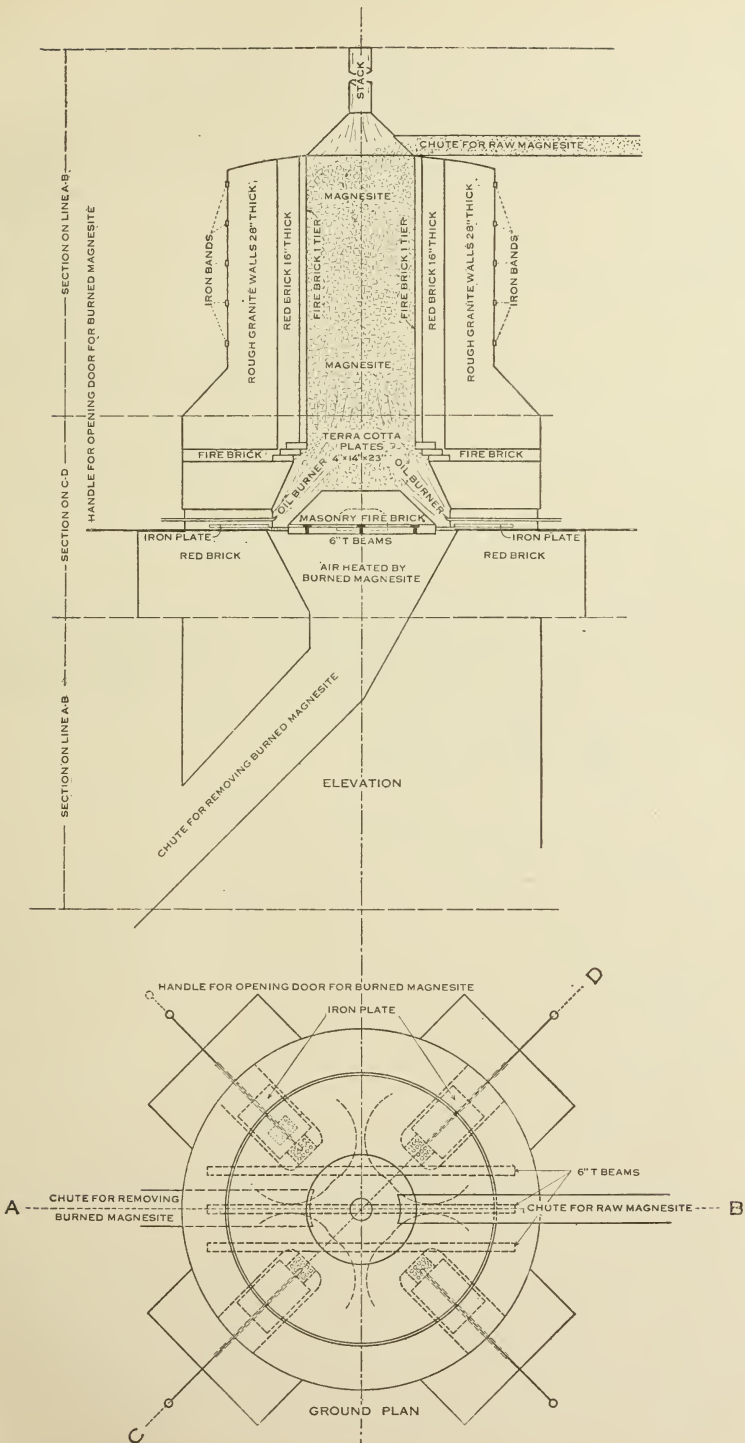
Elevation and plan of Willamette Pulp and Paper Company's furnace, 4 miles northeast of Porterville, Cal.
